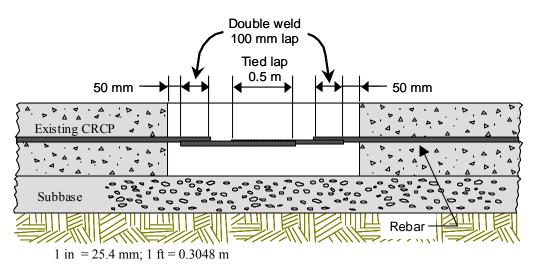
Details of welded or mechanical connection for CRCP repair (FHWA 1985).
